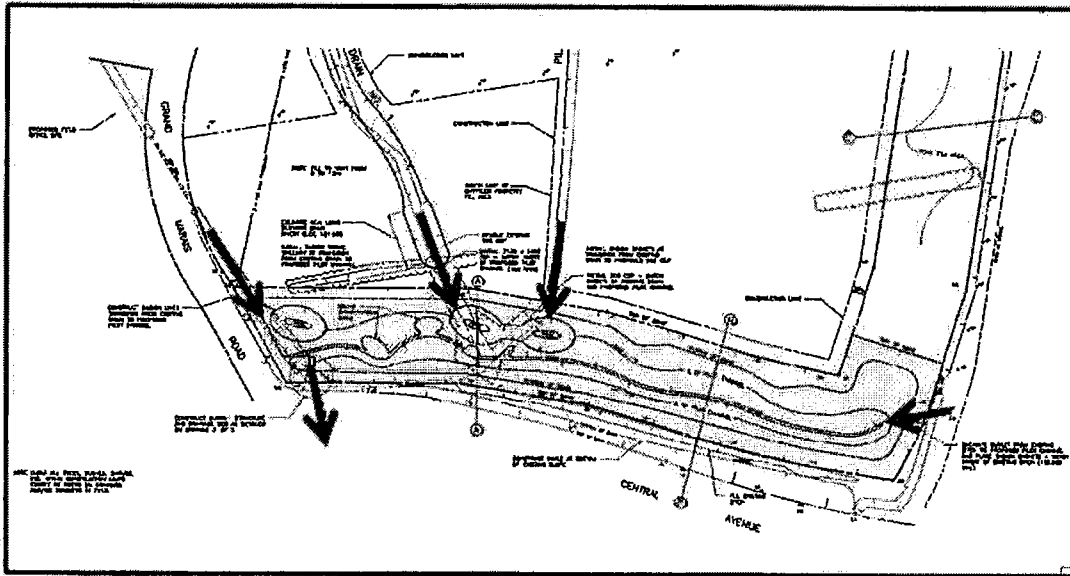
Central Avenue Pond – Pond Inlet and Outlet (red arrow) Locations
